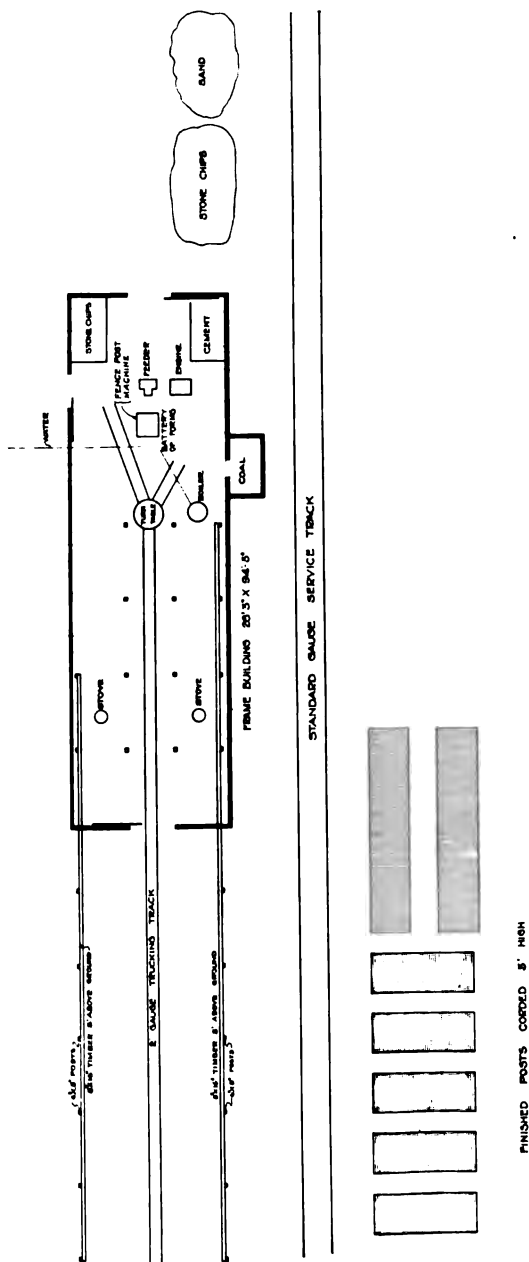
LAYOUT OF REINFORCED CONCRETE FENCE POST PLANT, HAVELOCK, NEB.
